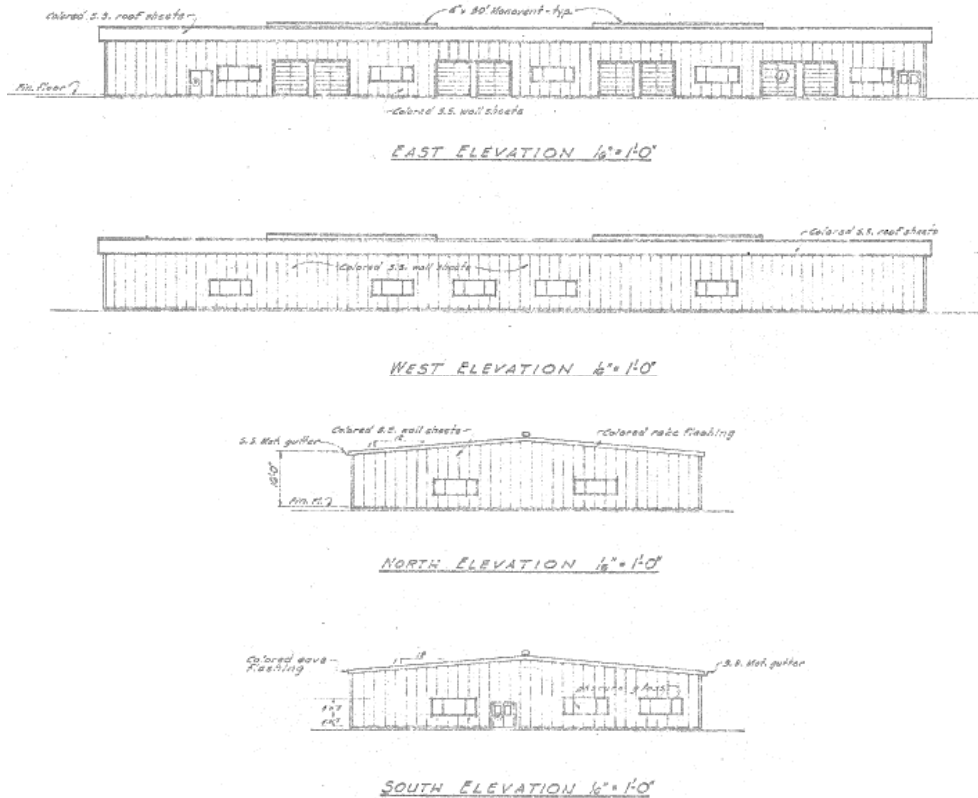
Original design of the commissary and warehouse building at 340 Bonair Siding Road, 1962. Robert Jones, Structural Engineer. Source: Stanford University LBRE.
